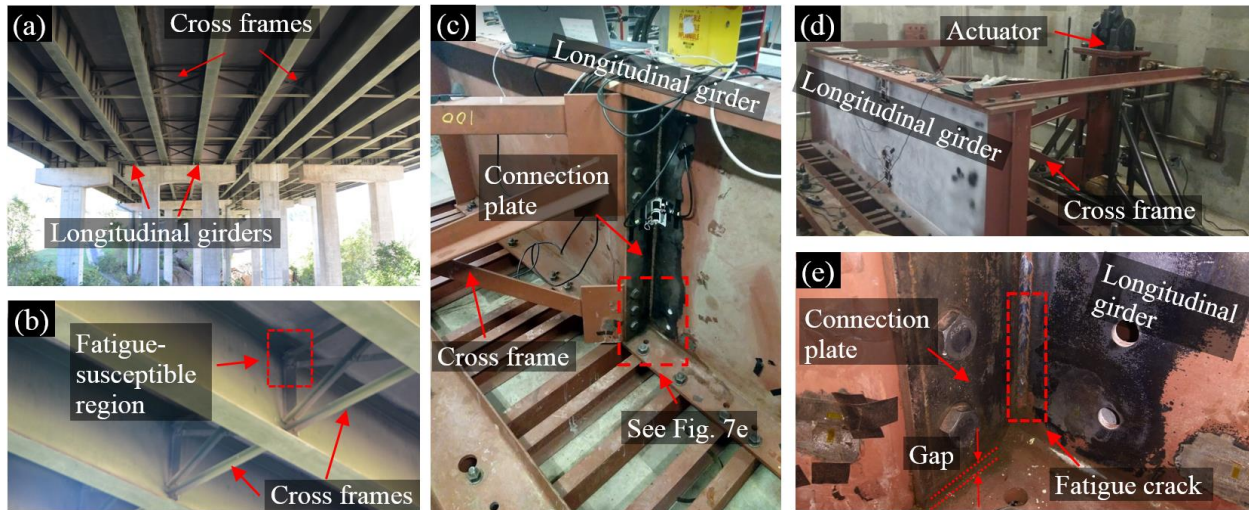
(a) A typical steel girder bridge in the field; (b) fatigue-susceptible region at the girder to cross-frame connection; (c) exterior view of the large-scale girder to cross-frame connection; and (d) interior view of the test specimen.
